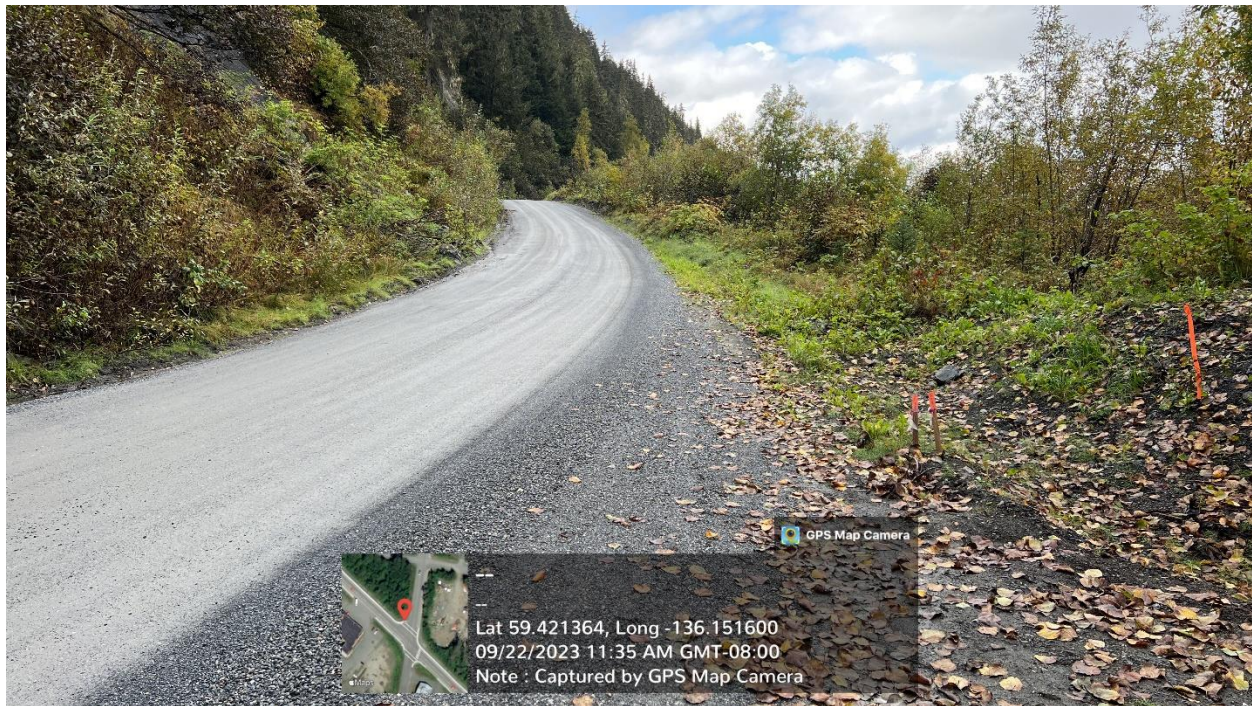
Porcupine Trail Road Phase I stop of work, photo facing end of road.
